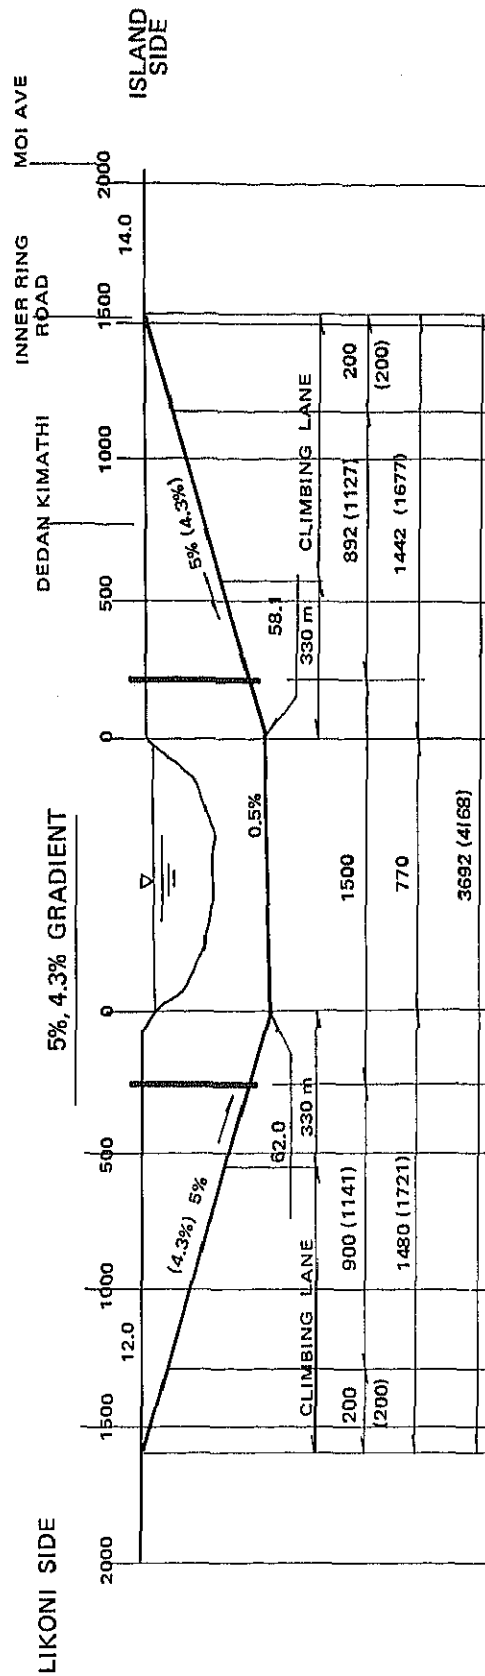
TUNNEL SECTION BY TUNNEL ALTERNATIVE T2
